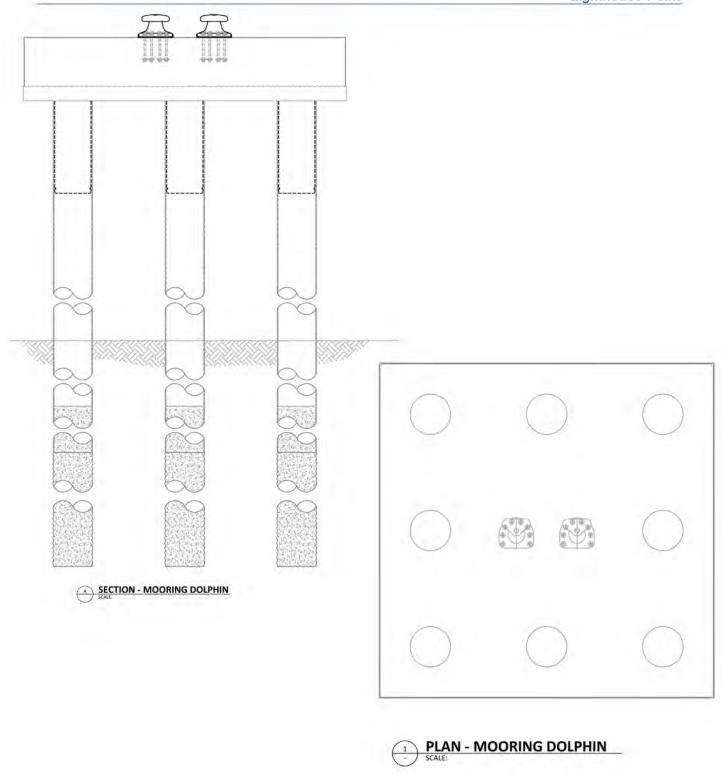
Cross Section and Plan View of Mooring Dolphin
